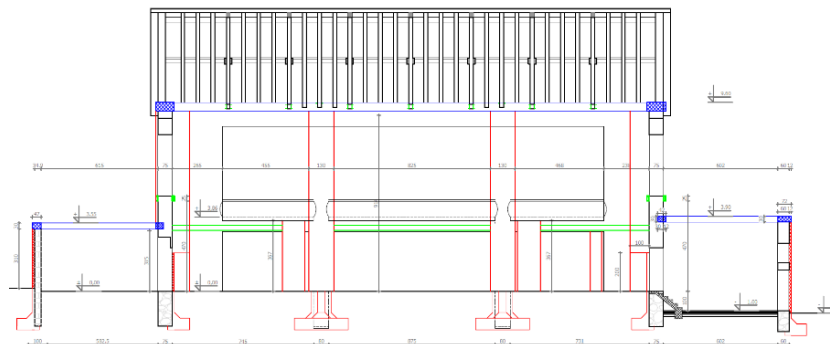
Characteristic cross section for the proposed strengthening solution: longitudinal cross section
